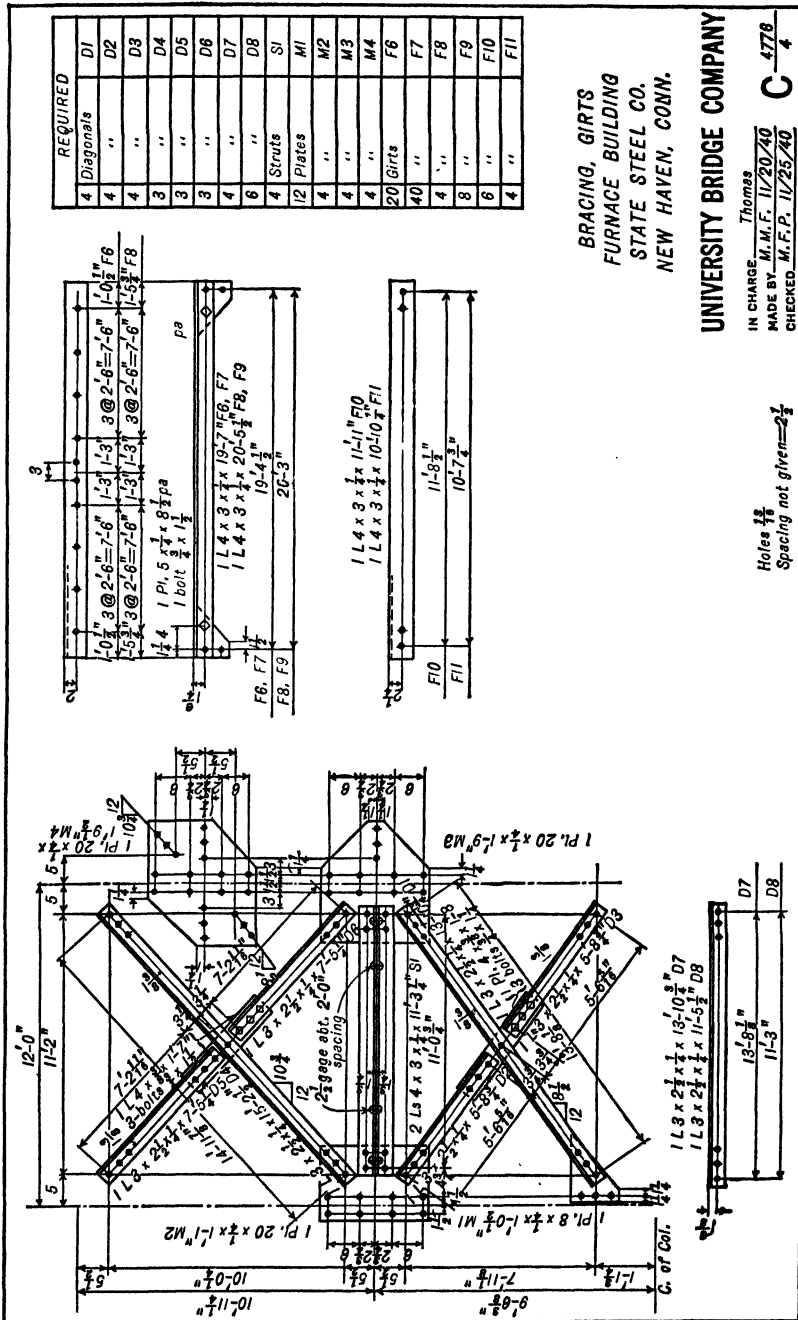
Bottom-Chord Bracing for a Mill Building.
